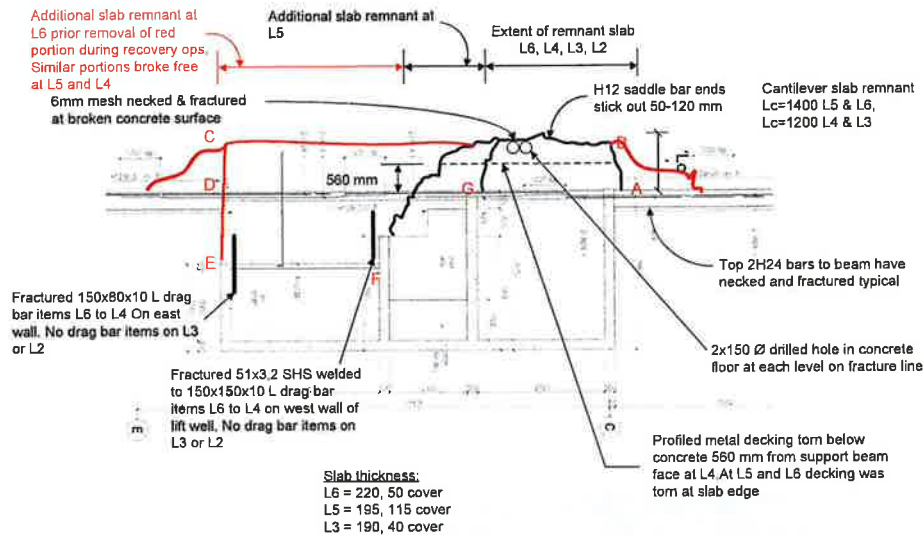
North Core slab remnant profile based on the Site Examination and review of collapse photos.
